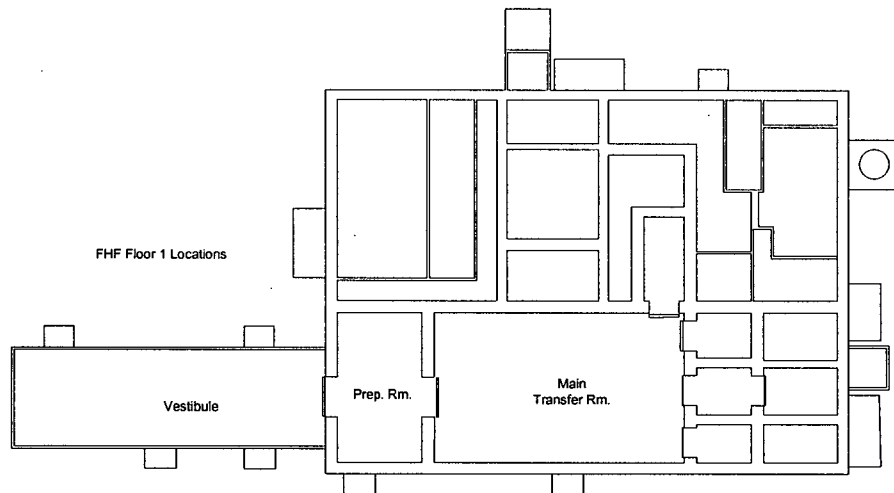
FHF 1st Floor Room Arrangement El. 0'
